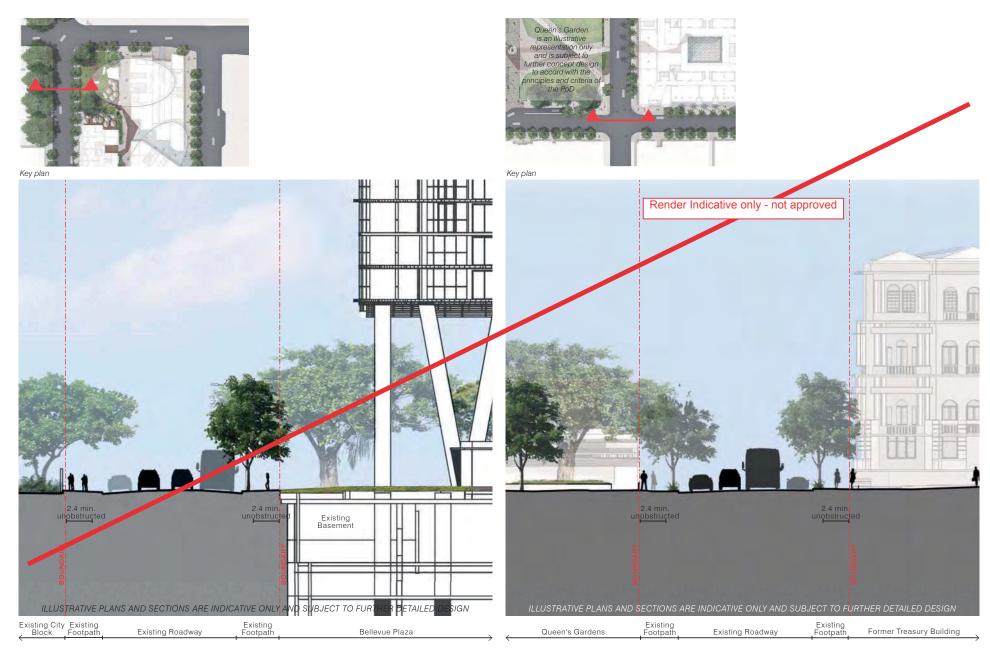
Elizabeth Street sectional elevation at North of Queen's Gardens and former Treasury Building
